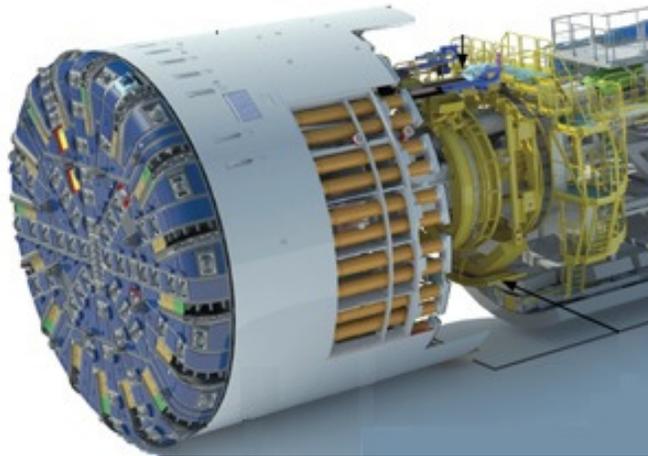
TBM « Federica » used for excavation of the South Base Tunnel (9 km long) between Saint Martin La Porte and La Praz.
